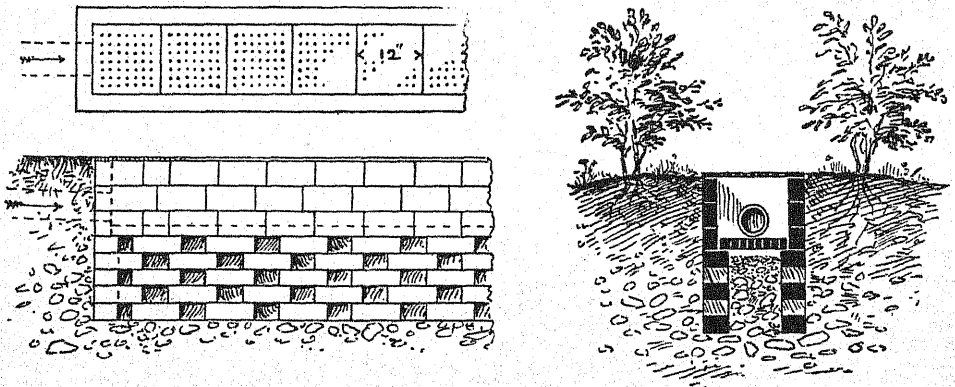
Plan, Section, and Elevation of Filtration-gutter.
